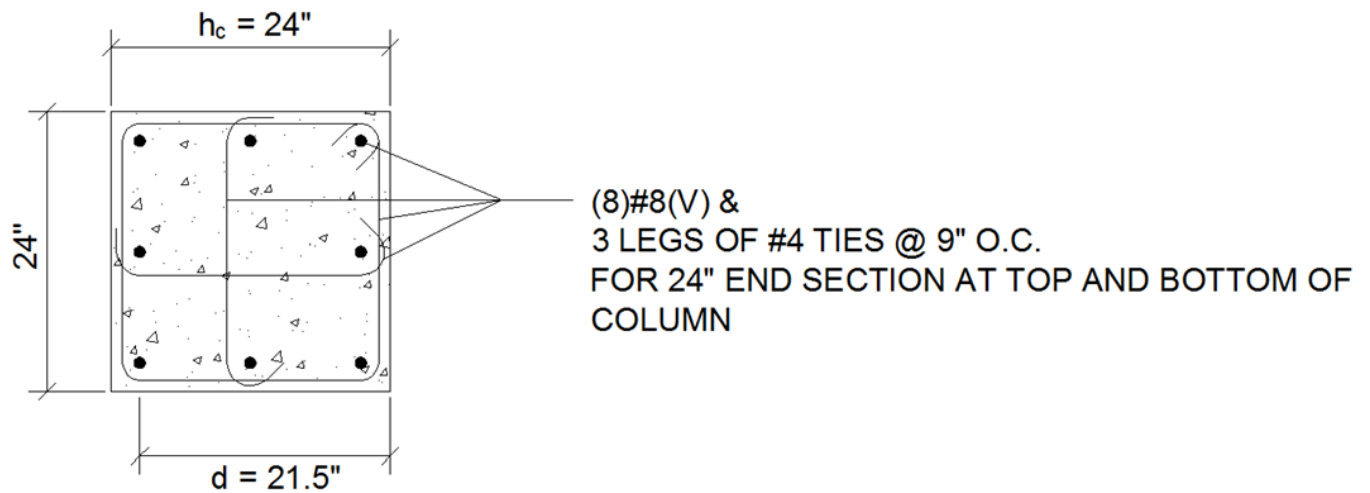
Interior column, end section cross-section for column at all floor levels based on SDC D design.
